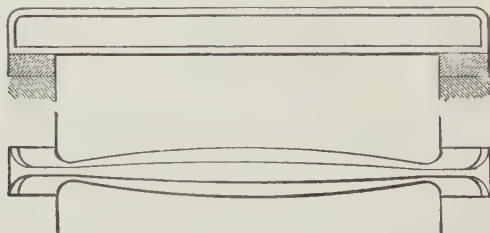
Elevation.*Fig. 455. *Plan.
